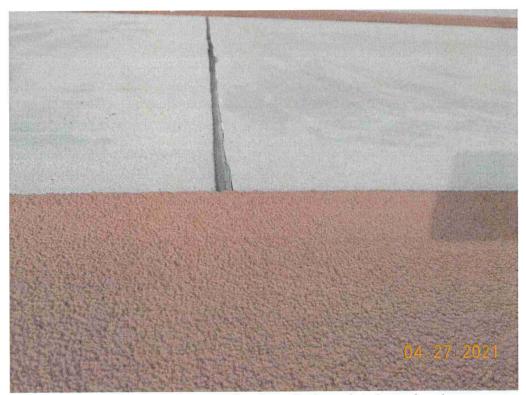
Vertical joint at the upper floor is caulked, needs to be replaced.
